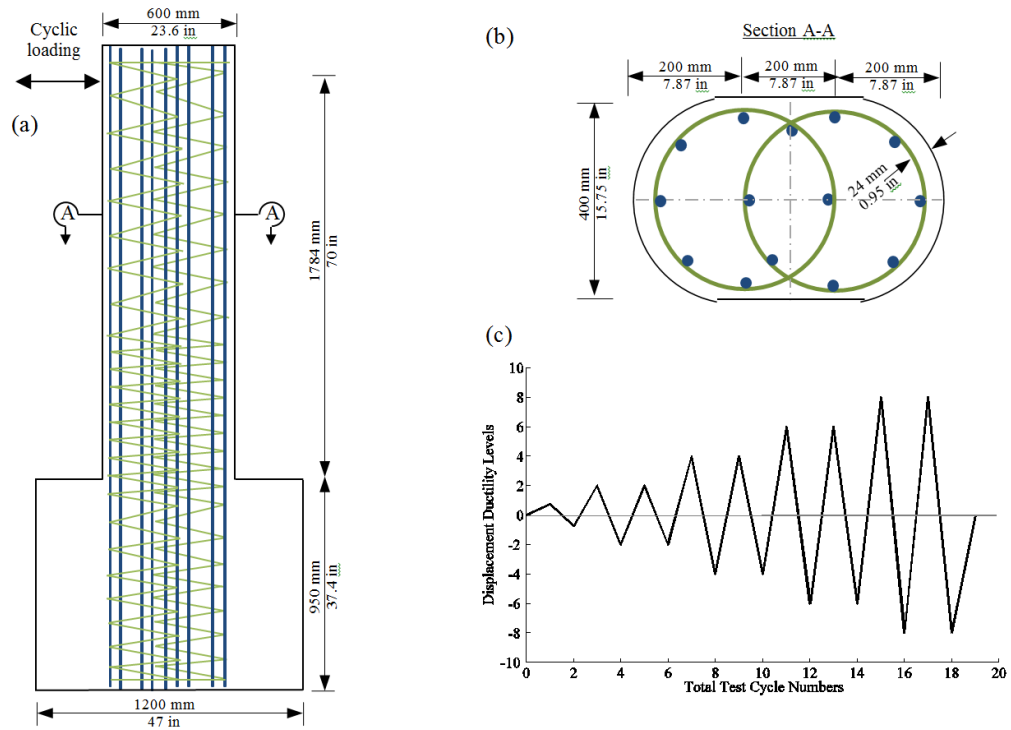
(a) Details of the column design, (b) Reinforcement detailing, (c) Displacement ductility levels
